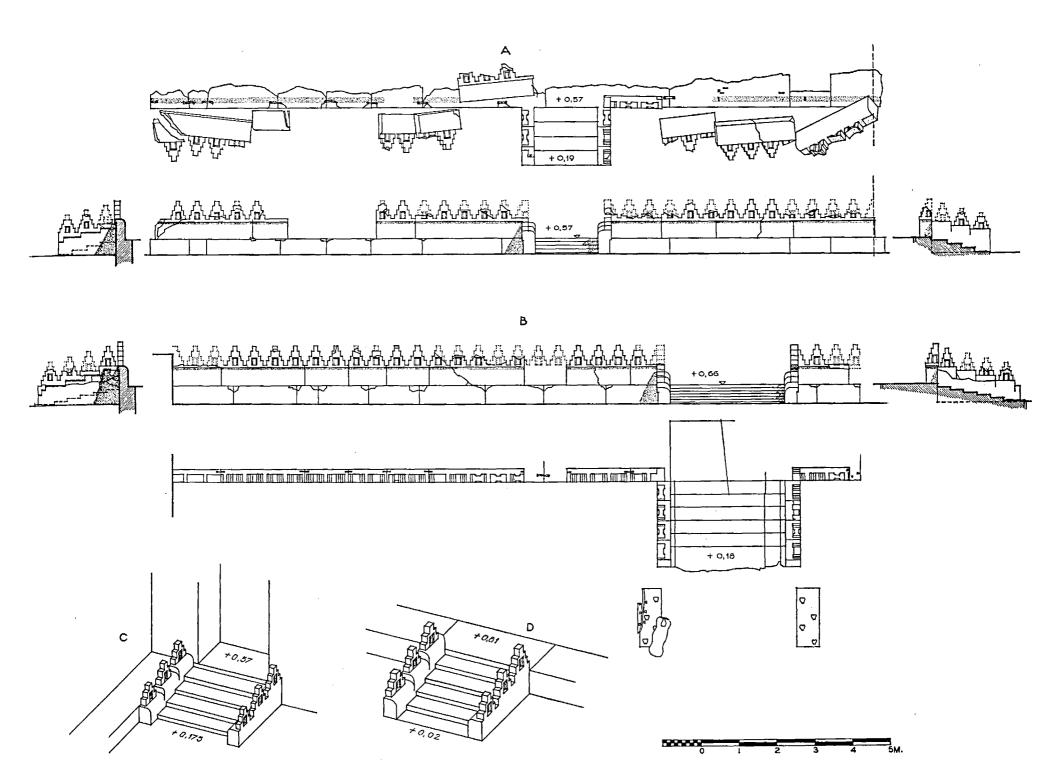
Plans and Reconstructed Elevations of Parts of Structures Shown on Fig. 14. Scale, 1:100
